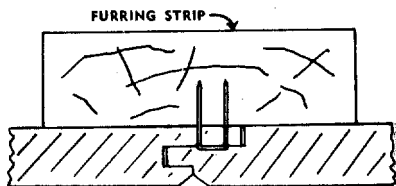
Section Through Interlocking Joint on Long Edges of Plank.
